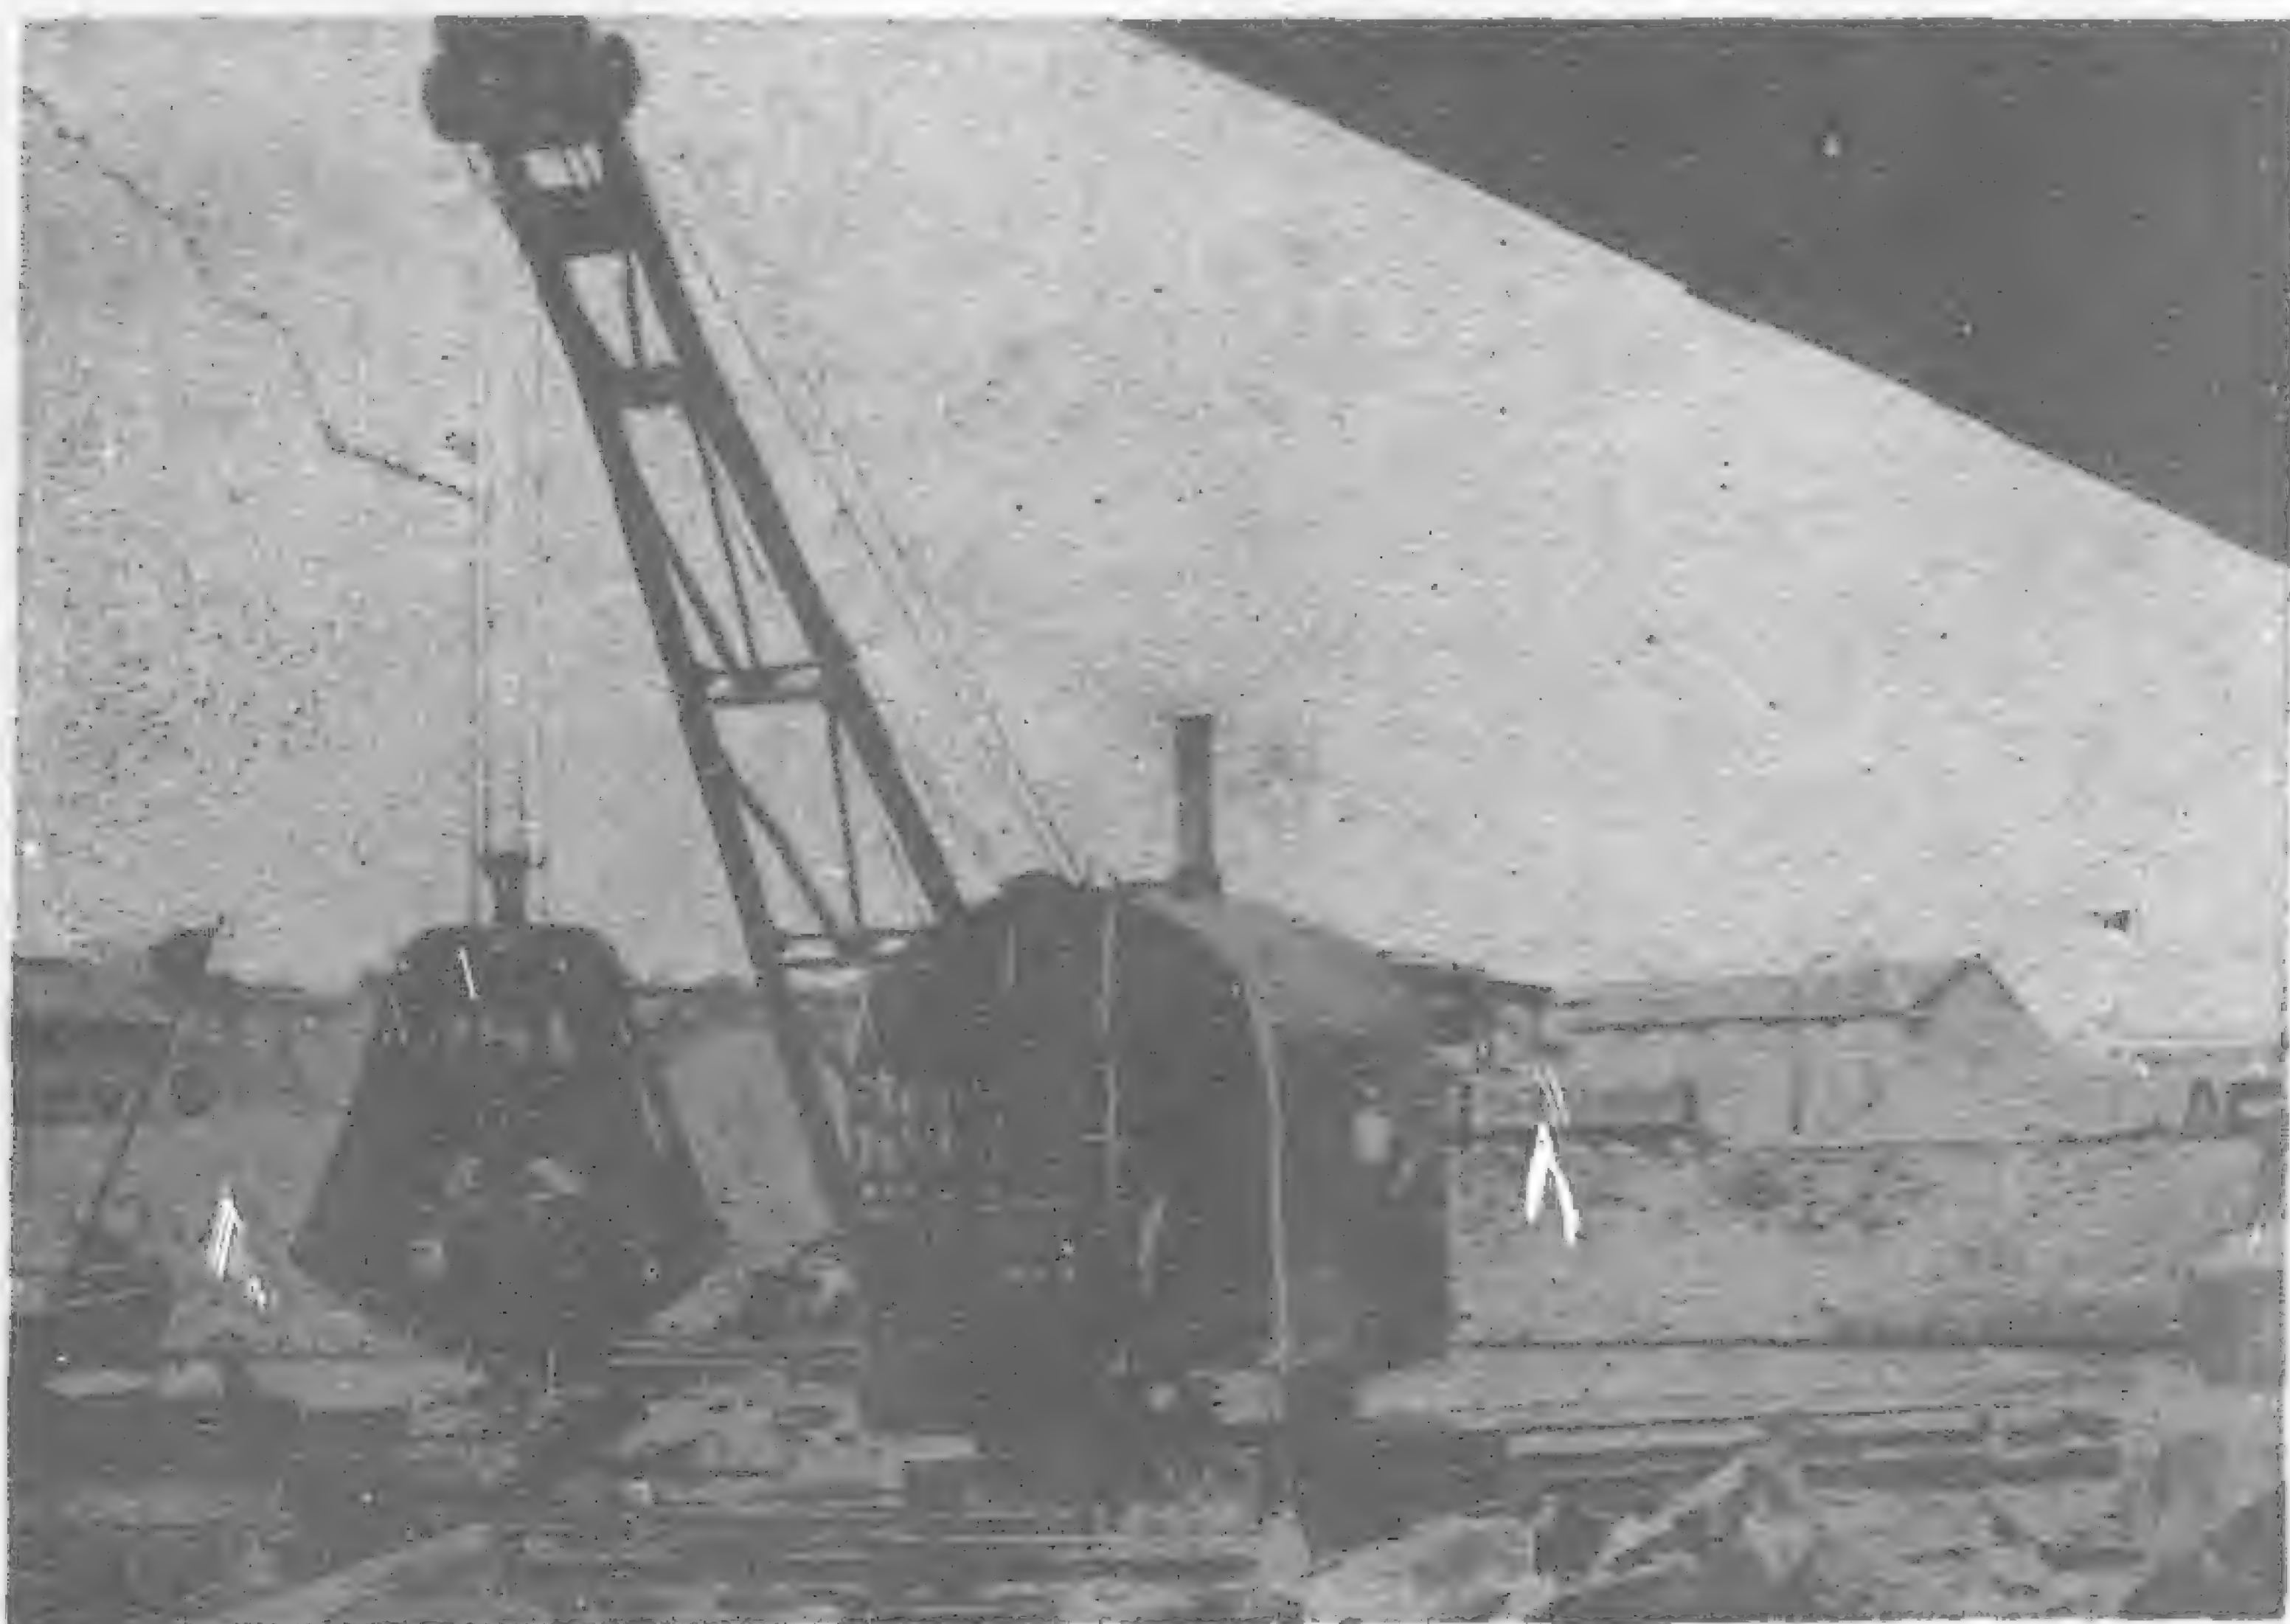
Floating steam crane with "Polyp" grab engaged in removing the foundation of a bridge pier after blasting operations.
